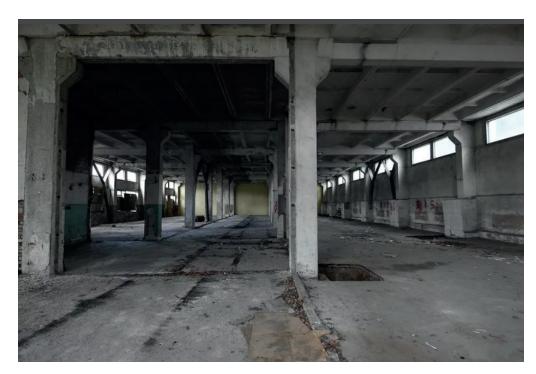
The building of a former porcelain factory, built of large lightweight concrete panels
